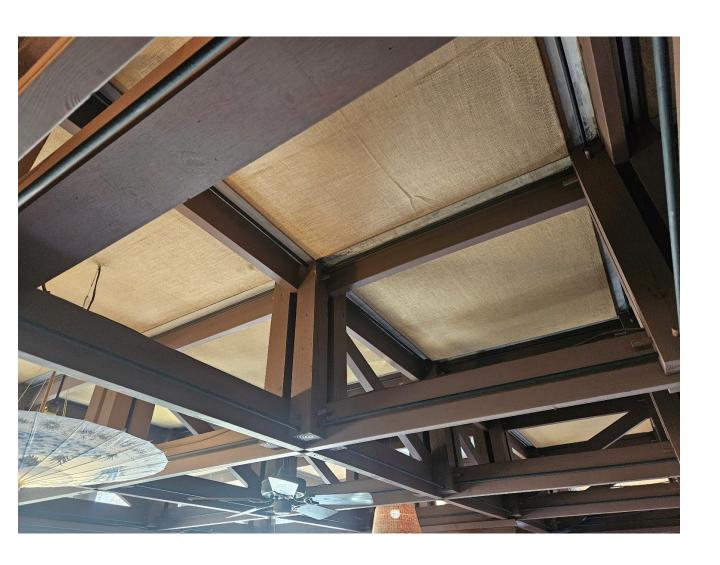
Detail view showing the wood spaceframe roof structure in the main living area on the northeast side of the building.
